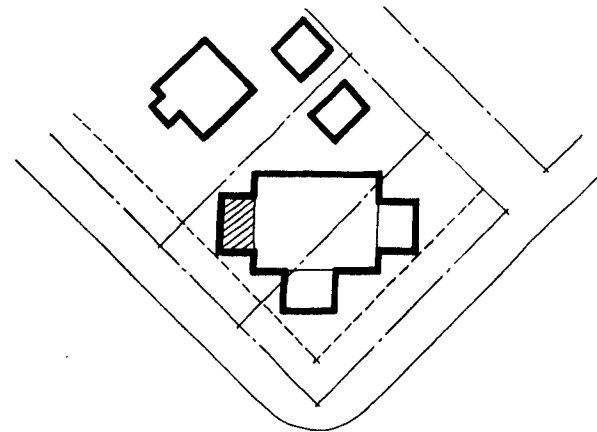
Additions or renovations to angled buildings on corner sites require special treatment
